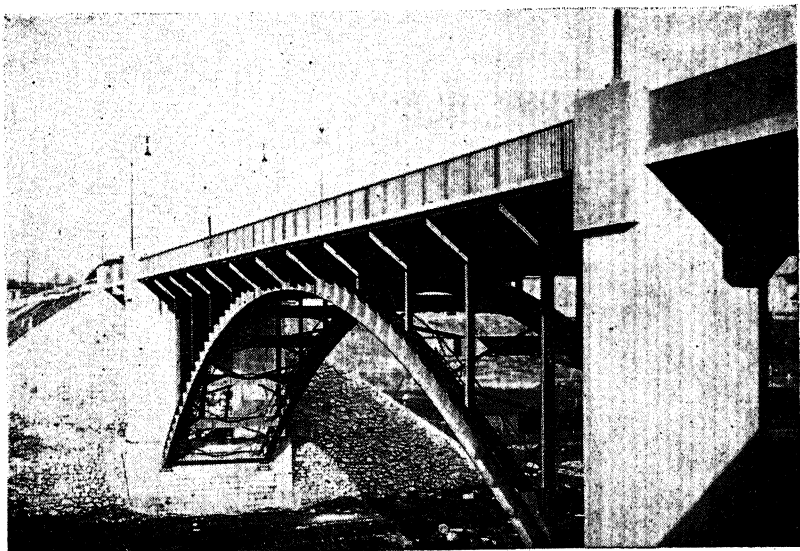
Two-hinged arch highway bridge, 166 foot span, all welded construction, located in Bohemia.
